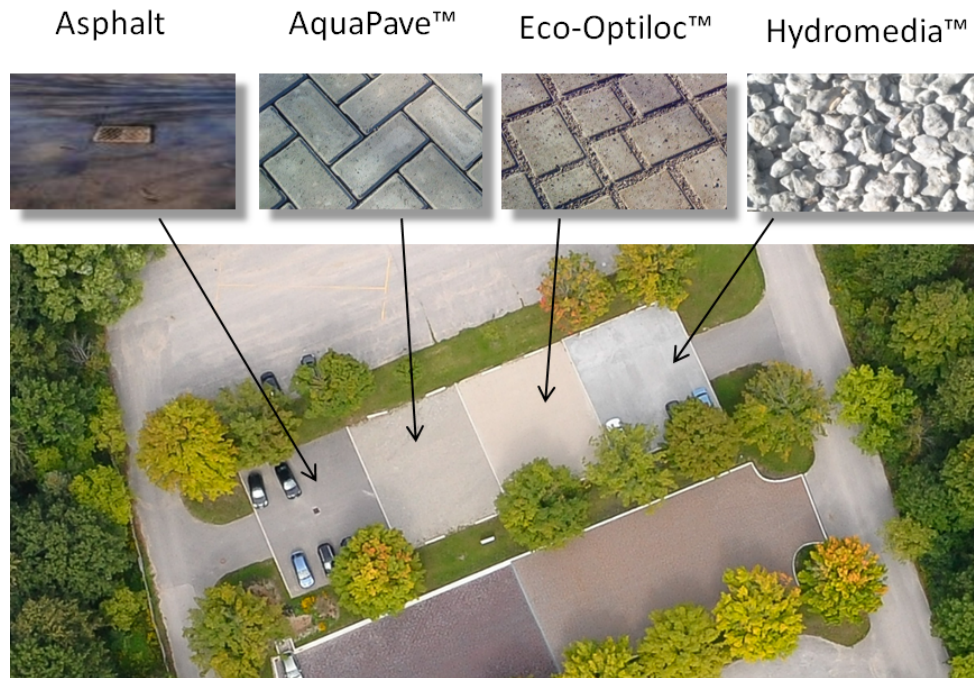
Photo of the research facility showing the conventional asphalt and three types of permeable pavement.
